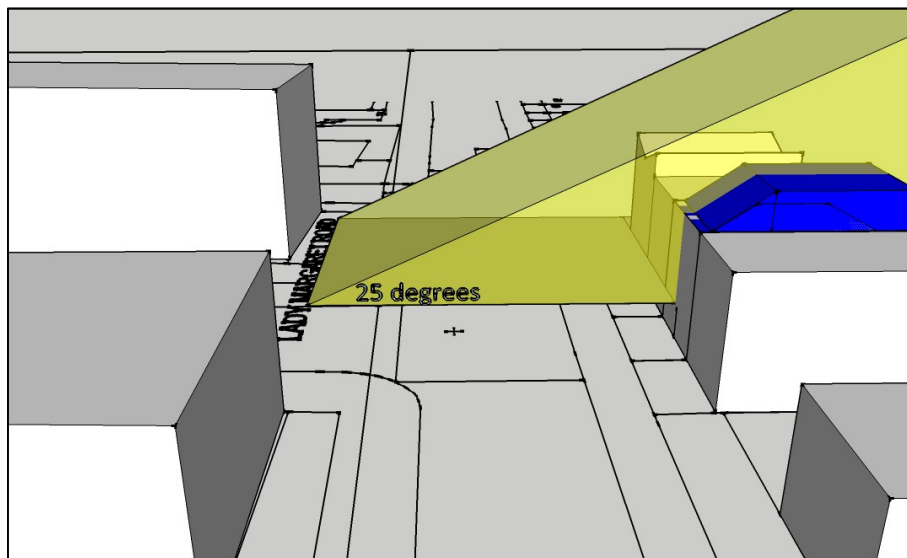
25 degree line – Ground Floor, Properties north of Leighton Road
